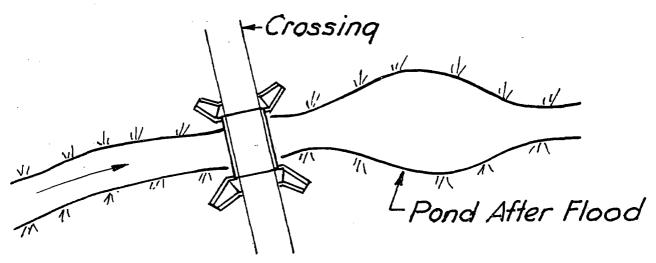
Horizontal or vertical channel constrictions. A firm or riprapped bottom or a horizontal constriction can cause a deep scour hole downstream with severe bank erosion resulting in downstream ponding as shown in the sketch.
